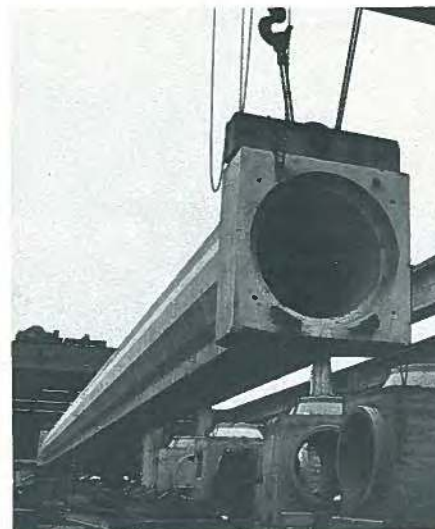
16-sided precast prestressed hollow pipe section 120 ft (36.6 m) long and weighing 85 tons (77 t) being lifted at plant for Lake Washington interceptor sewer.
